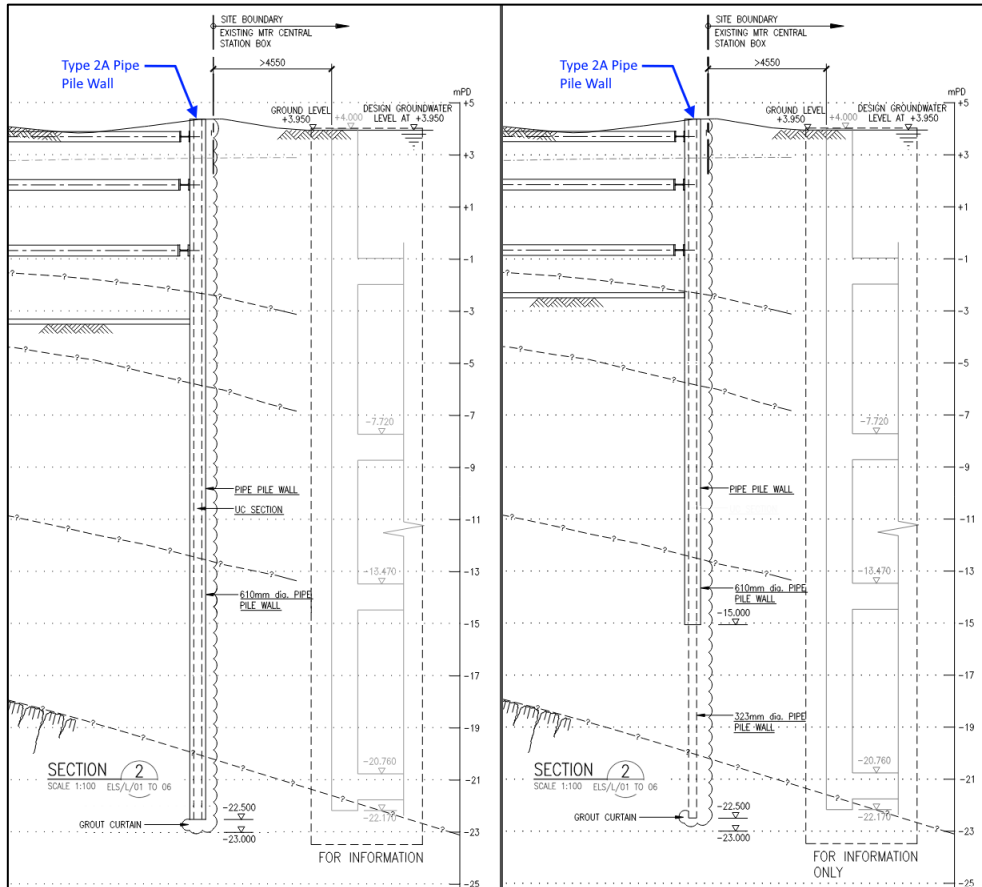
Change of Pile Wall from Casing with H-section (Left) to Tube-in-tube (Right)
